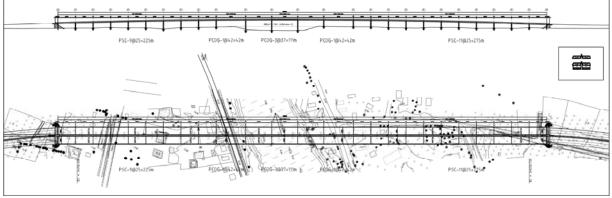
General View of the Bridge of Pursat Bypass for Crossing Pursat River
